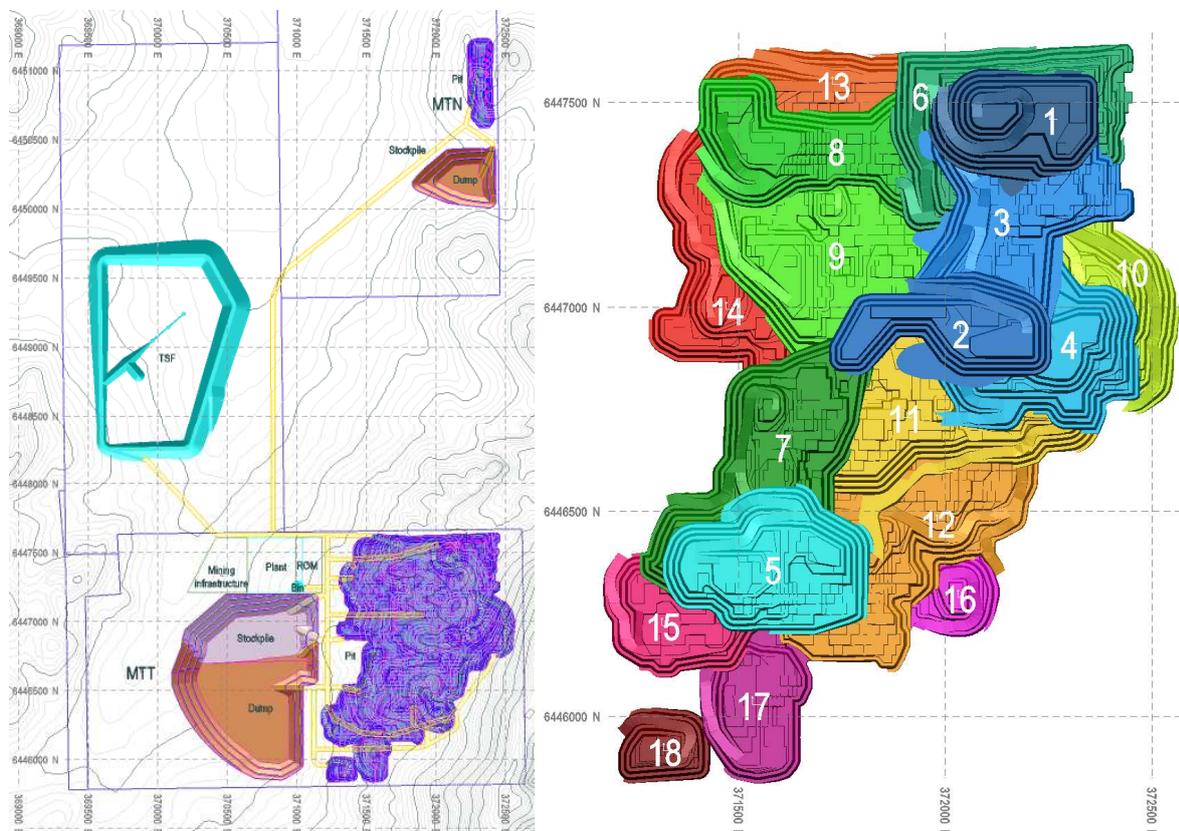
Preliminary mine layout showing pits, dumps, plant, infrastructure and TSF (left) and pit stages (right).
